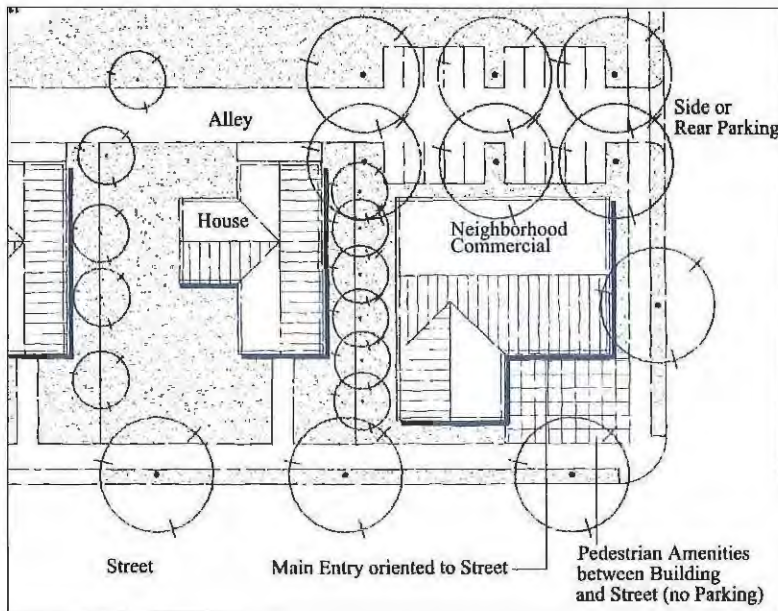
Example of neighborhood-commercial development with side or rear-yard parking
